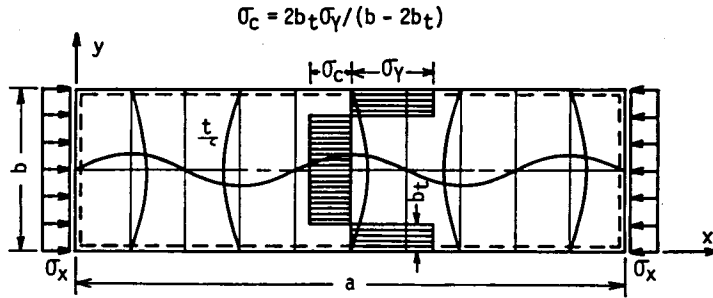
Rectangular plate with welding residual stresses under thrust
